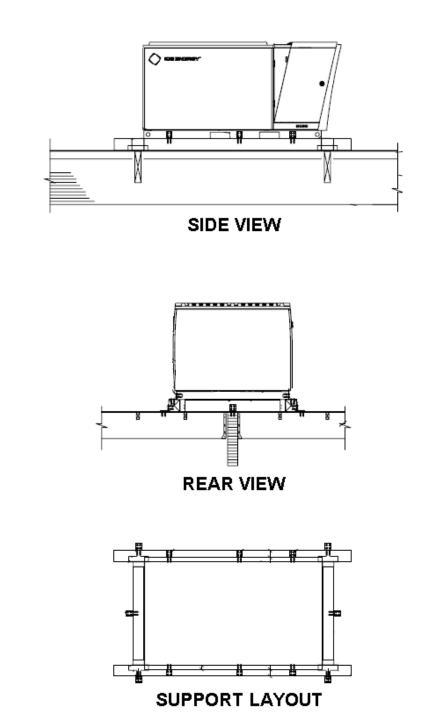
Typical Roof Mount Installation (Steel Support Structure)
